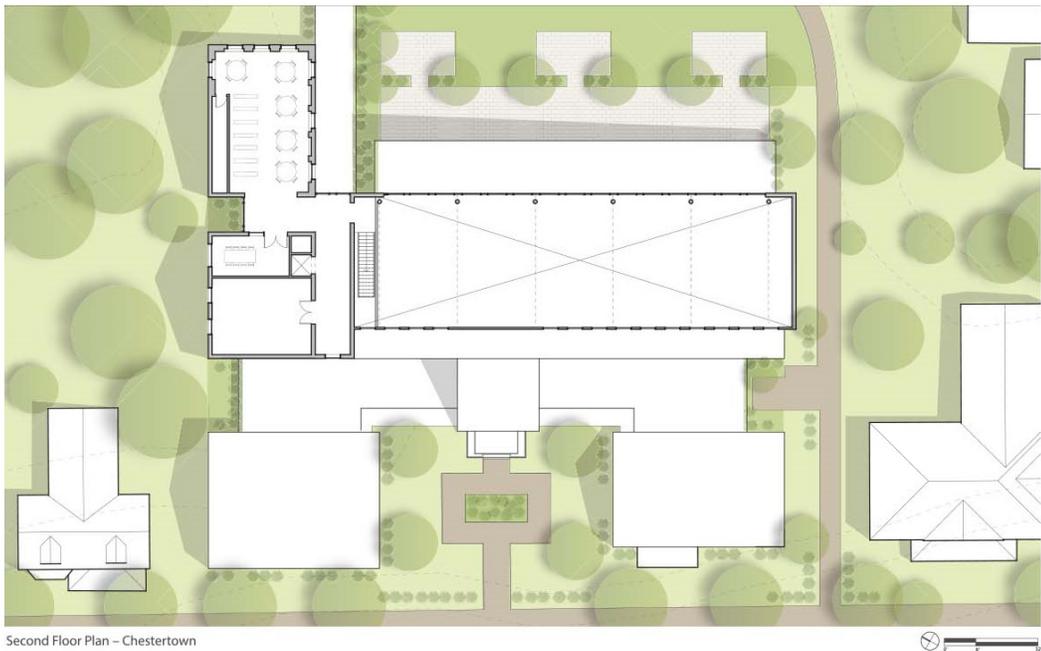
Chestertown, MD – Second Floor Plan, Source- Author, 2014
